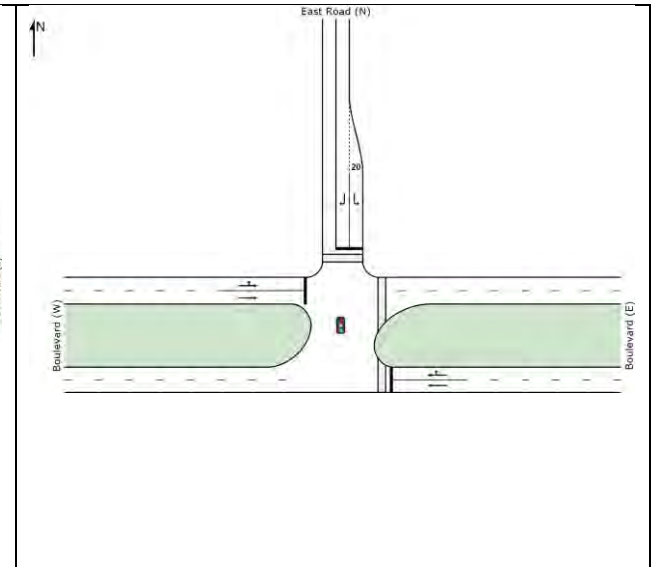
UDS Feasibility Design Parkes Way Boulevard – East Road Intersection
